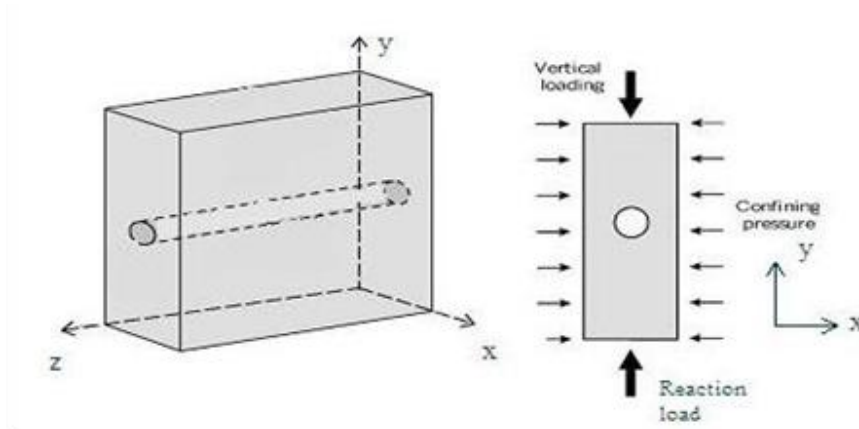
Sectional view of a long tunnel (Source: Duvall & Obert, 1967)
